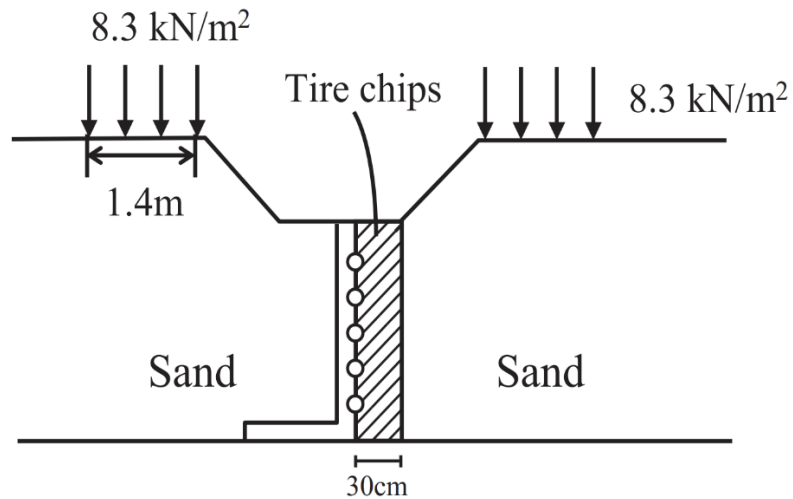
Experimental setup of retaining wall backfilled with tire chips and sand (Hazarika et al., 2005)
